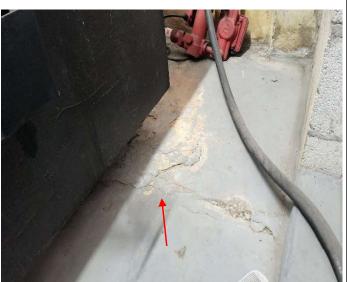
Cracked and spalled concrete at the Generator & Fire Pump Room.
